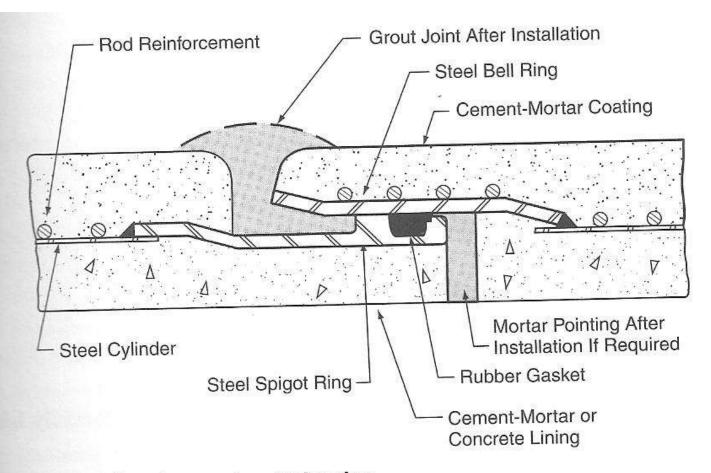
Prestressed concrete embedded-cylinder pipe
